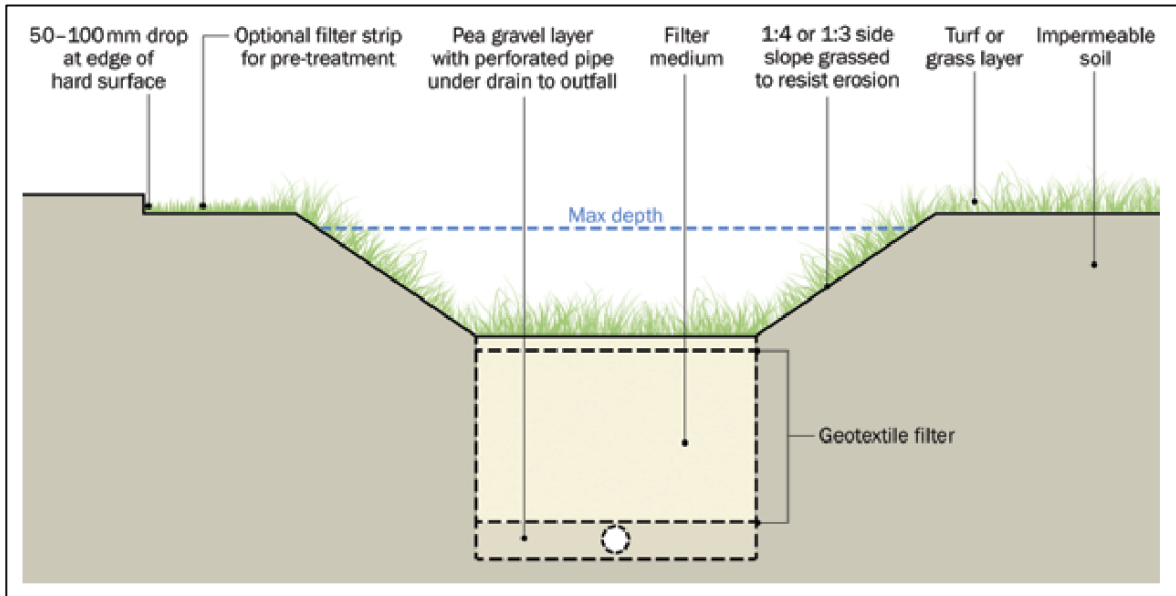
Typical cross-section detail of a lined swale (Source: CIRIA SuDS Manual)
